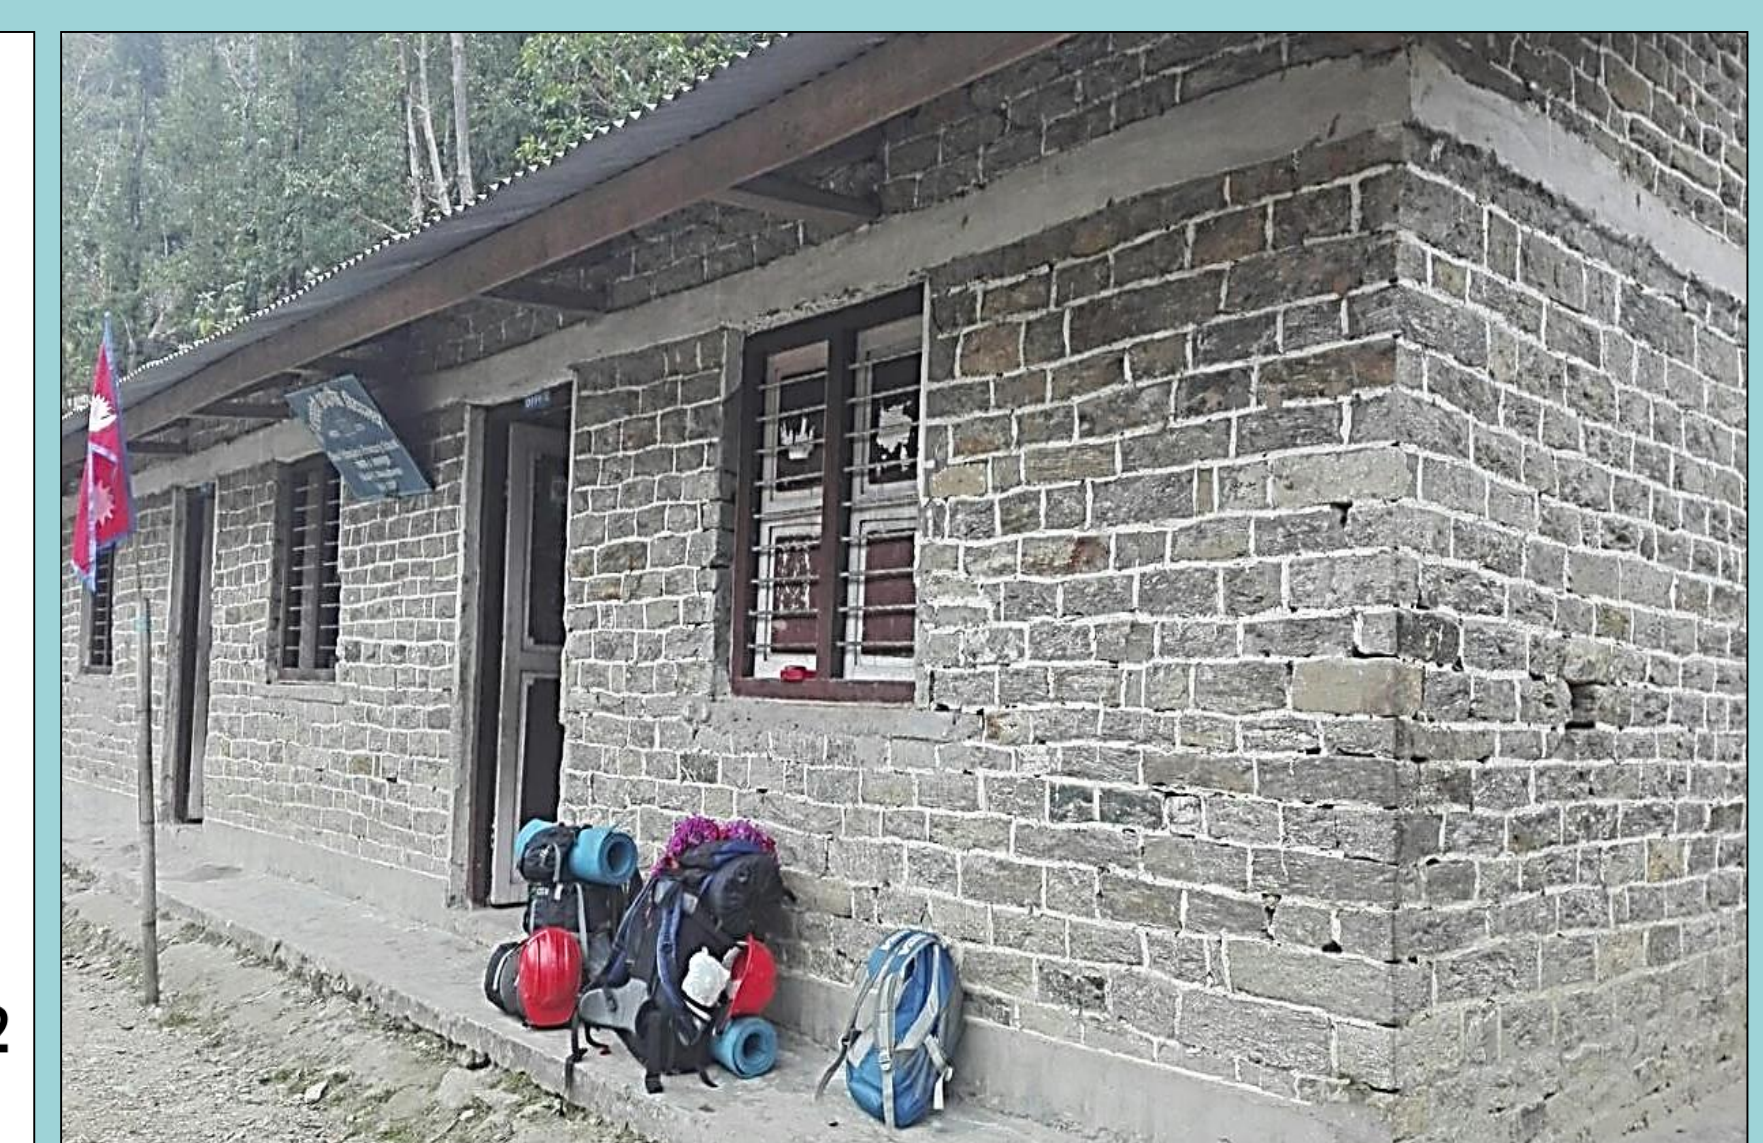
A dressed stone in cement mortar URM school building with a lintel level band beam.
